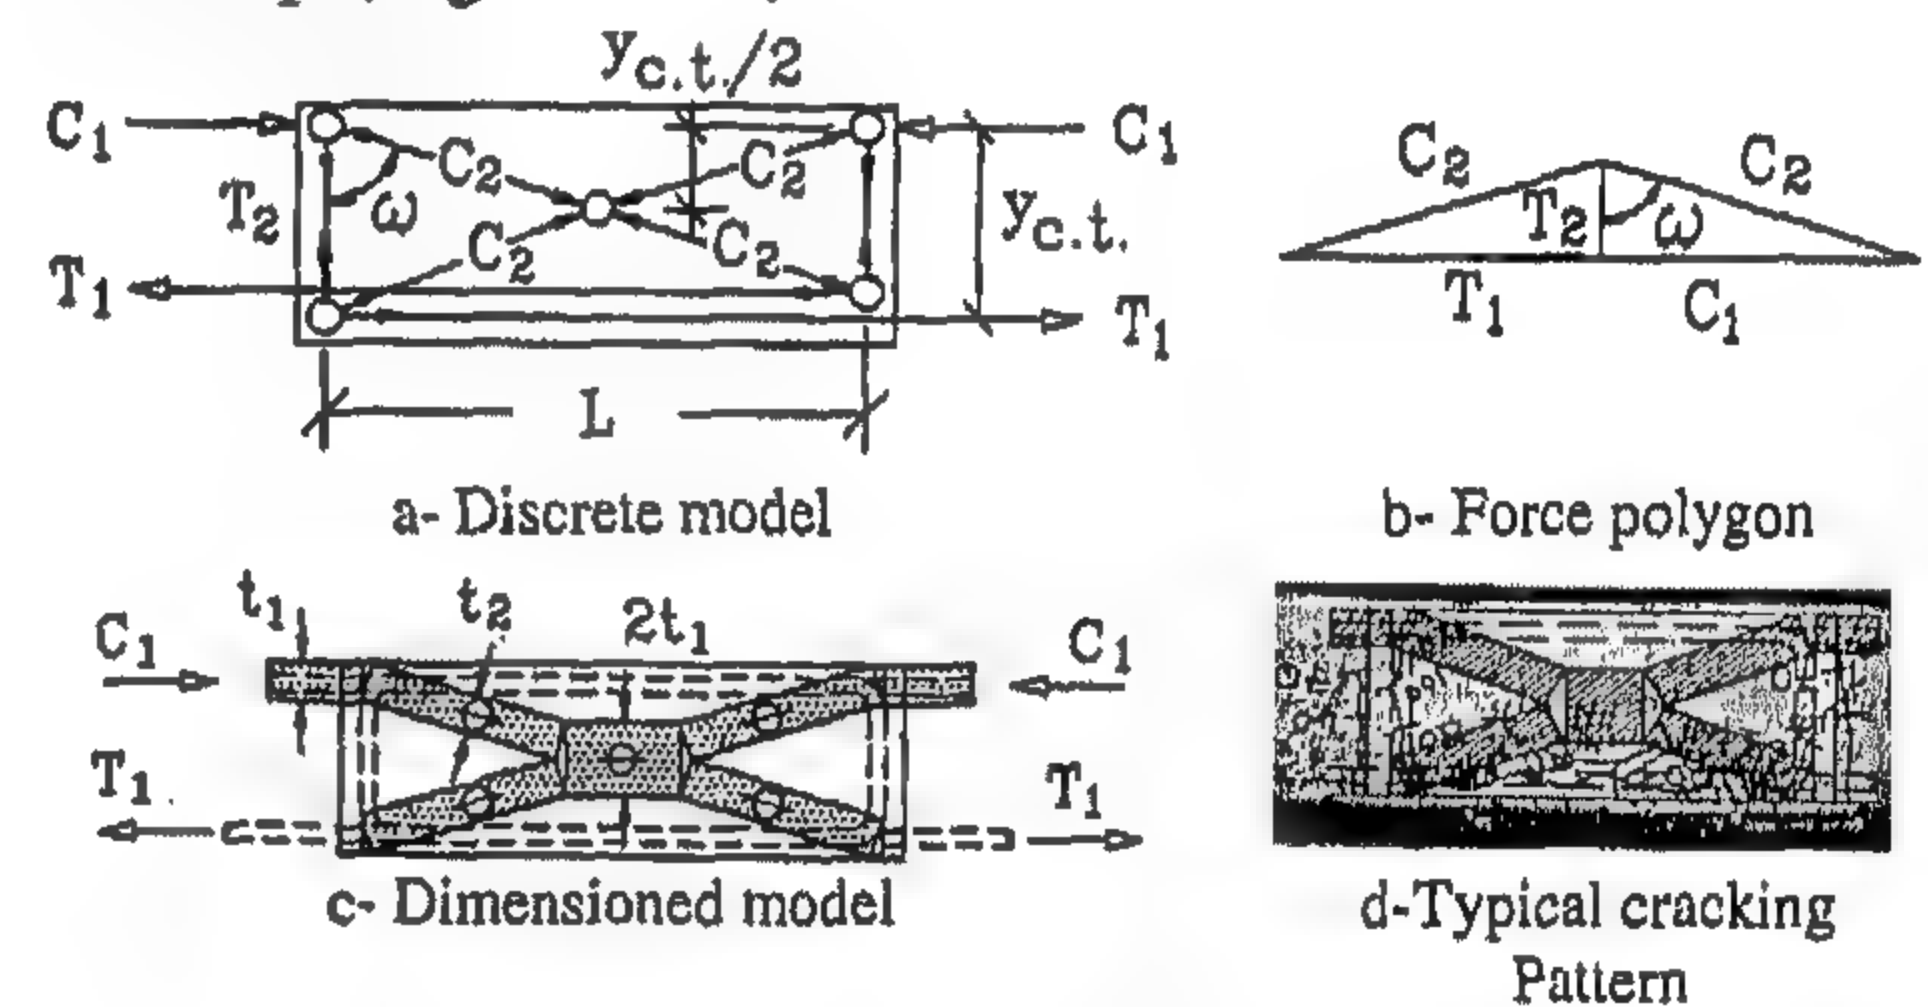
Detailed Strut-and Tie Model for Loop Detail
